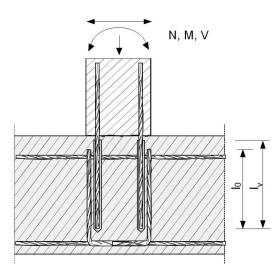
Overlapping joint with existing reinforcement of supports or walls subject to bending stress to a base. The reinforcement bars are subject to tensile stress.
